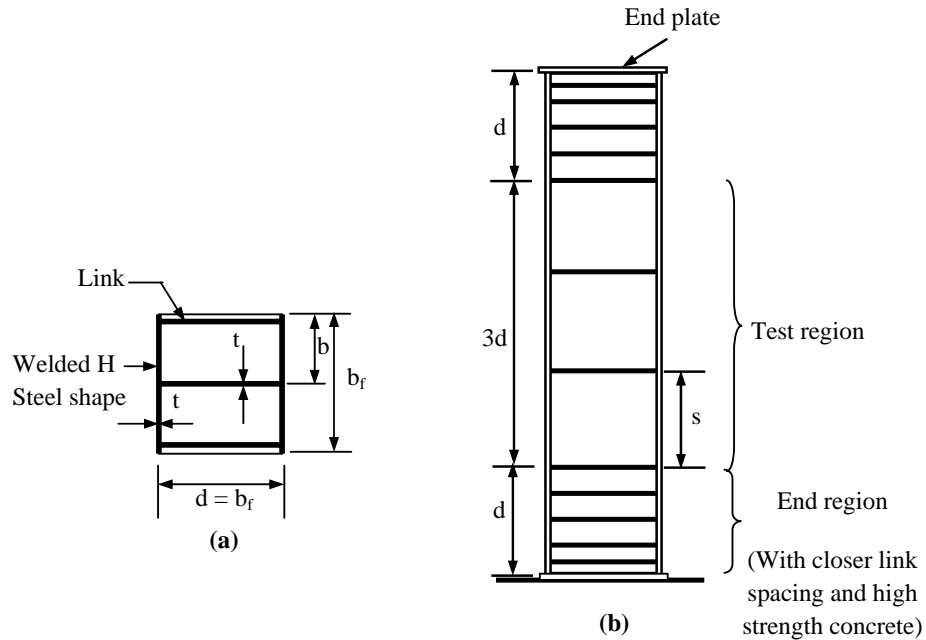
Typical PEC Test Column, (a) Cross-section, (b) Elevation
